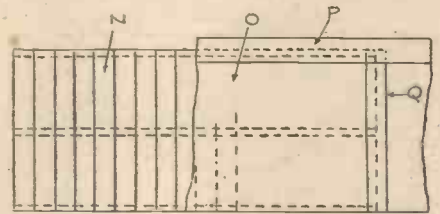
ROOF UNIT WITH SHEET ROOFING MATERIAL.
